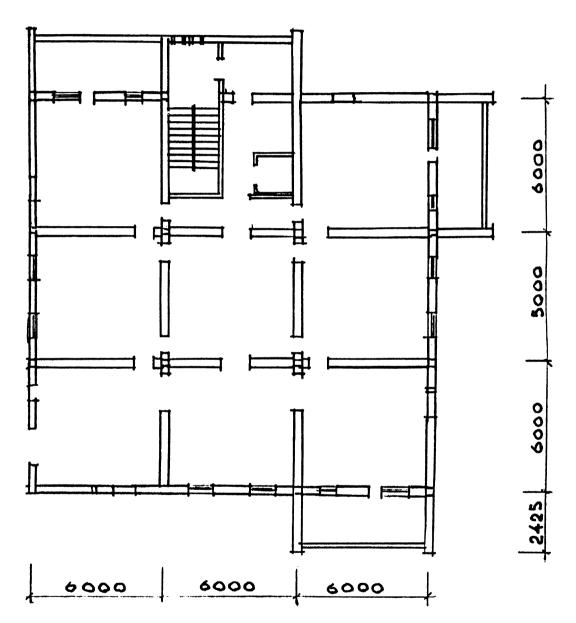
Large-panel 9-story residential building of series A1-451 KP 16/1
